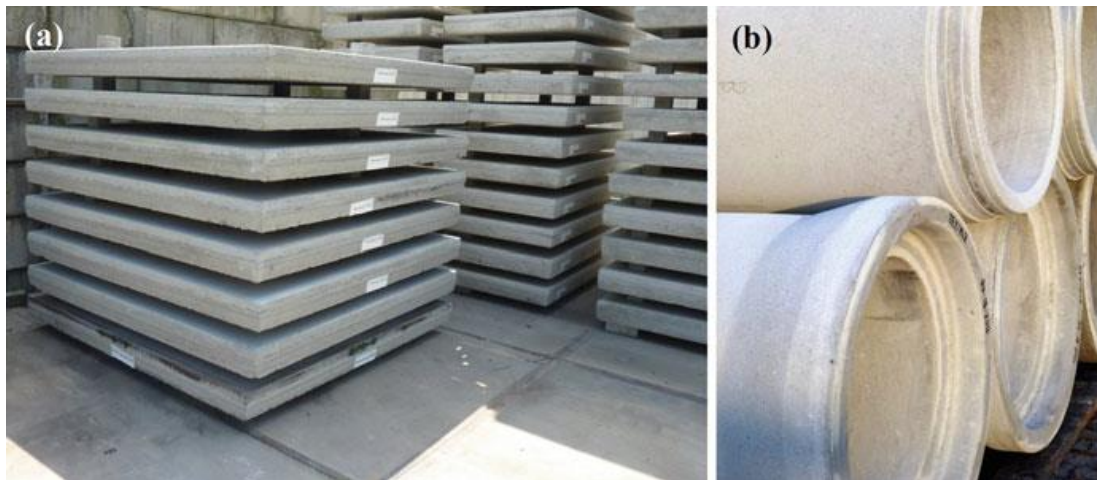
Precast Geopolymer concrete products (a) slabs; (b) pipes
